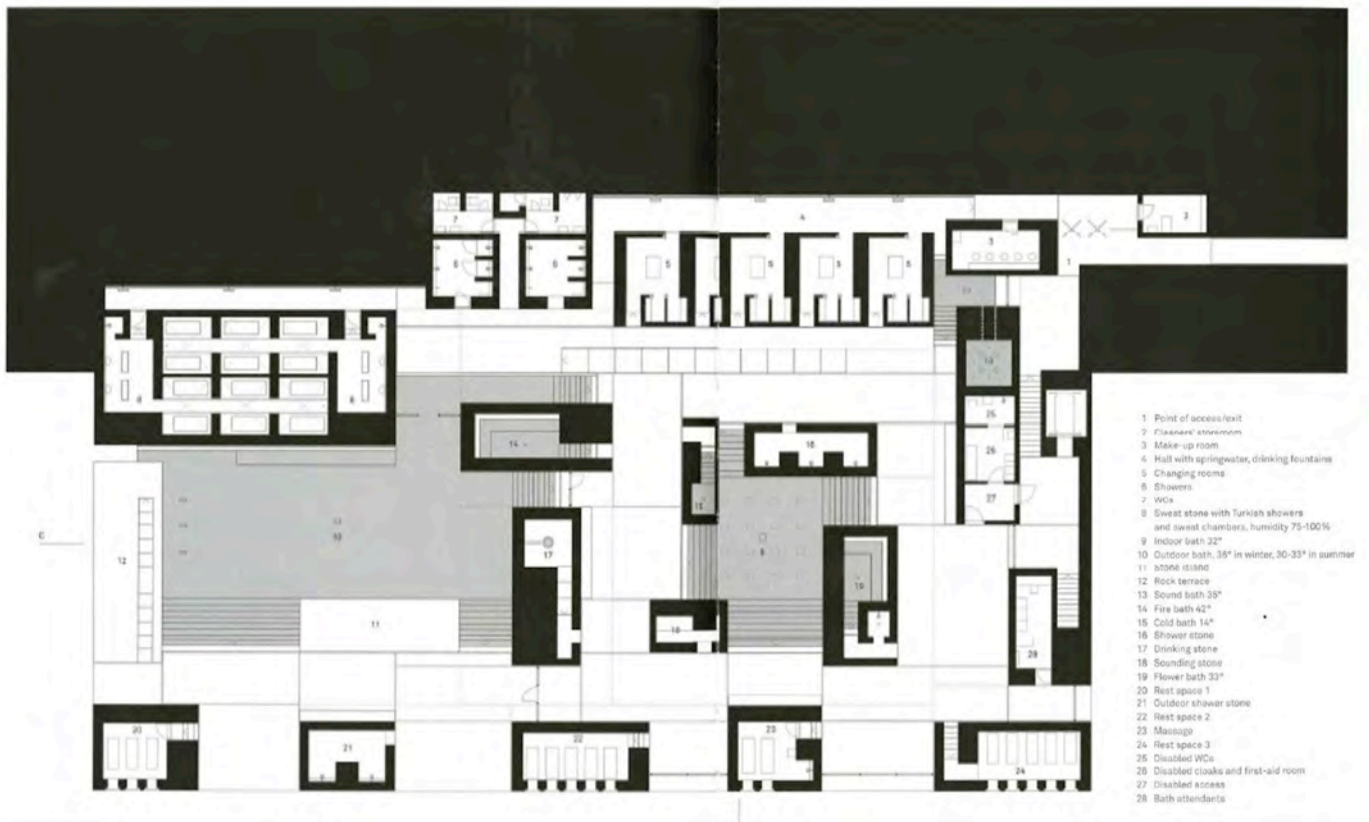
Floor Plan of Therme Vals [Image by Peter Zumthor]
